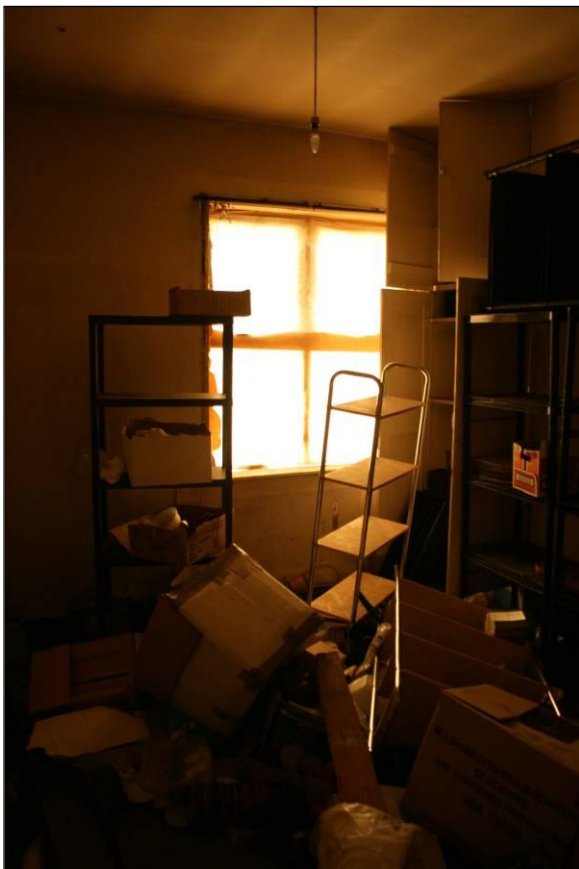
View of room 8 showing original plank and batten cupboards, viewed looking north-east
